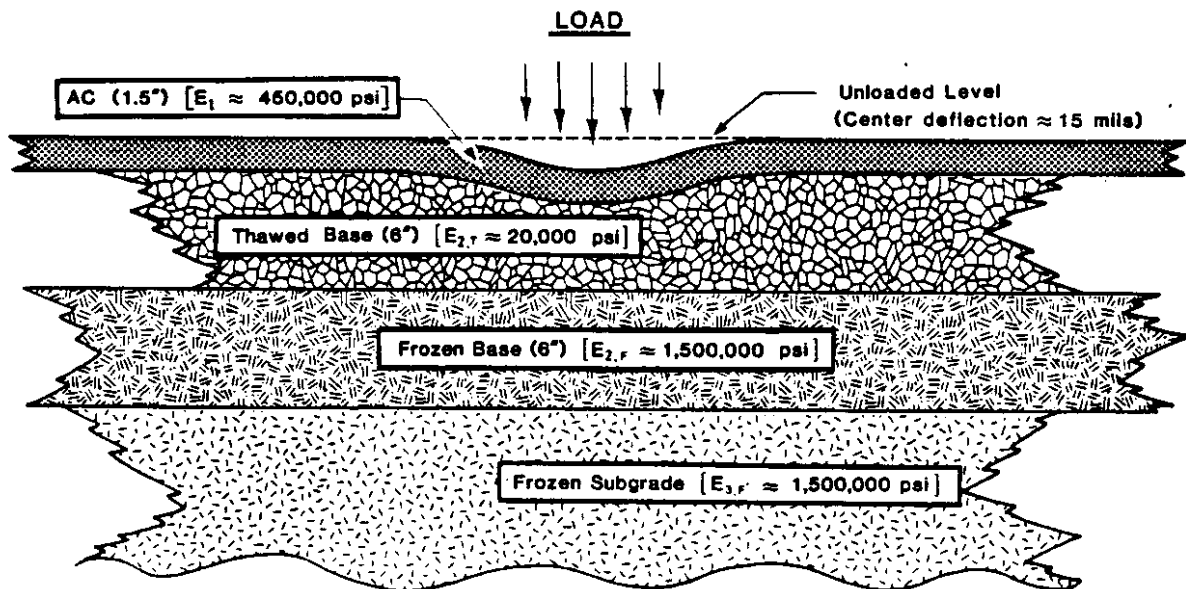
Hypothetical Case for a Partially Frozen Asphalt Pavement Under a 9,000 lb Load [after Ref. VI-6]
